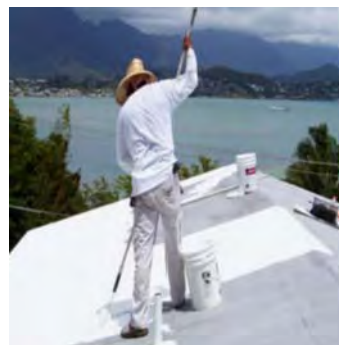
Reflective white roof (Cool Roof Hawaii, 2013)
